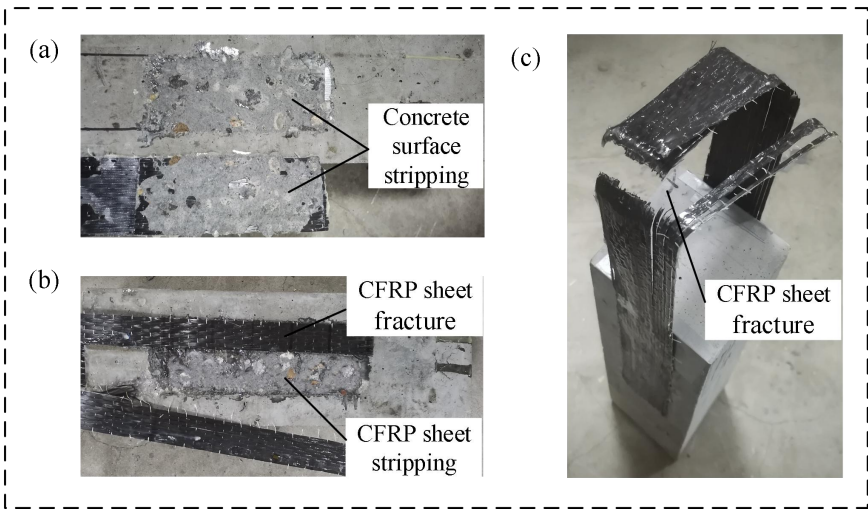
Damage patterns: (a) debonding in concrete; (b) concrete debonding and partial CFRP sheet fractured; (c) CFRP sheet fractured.
